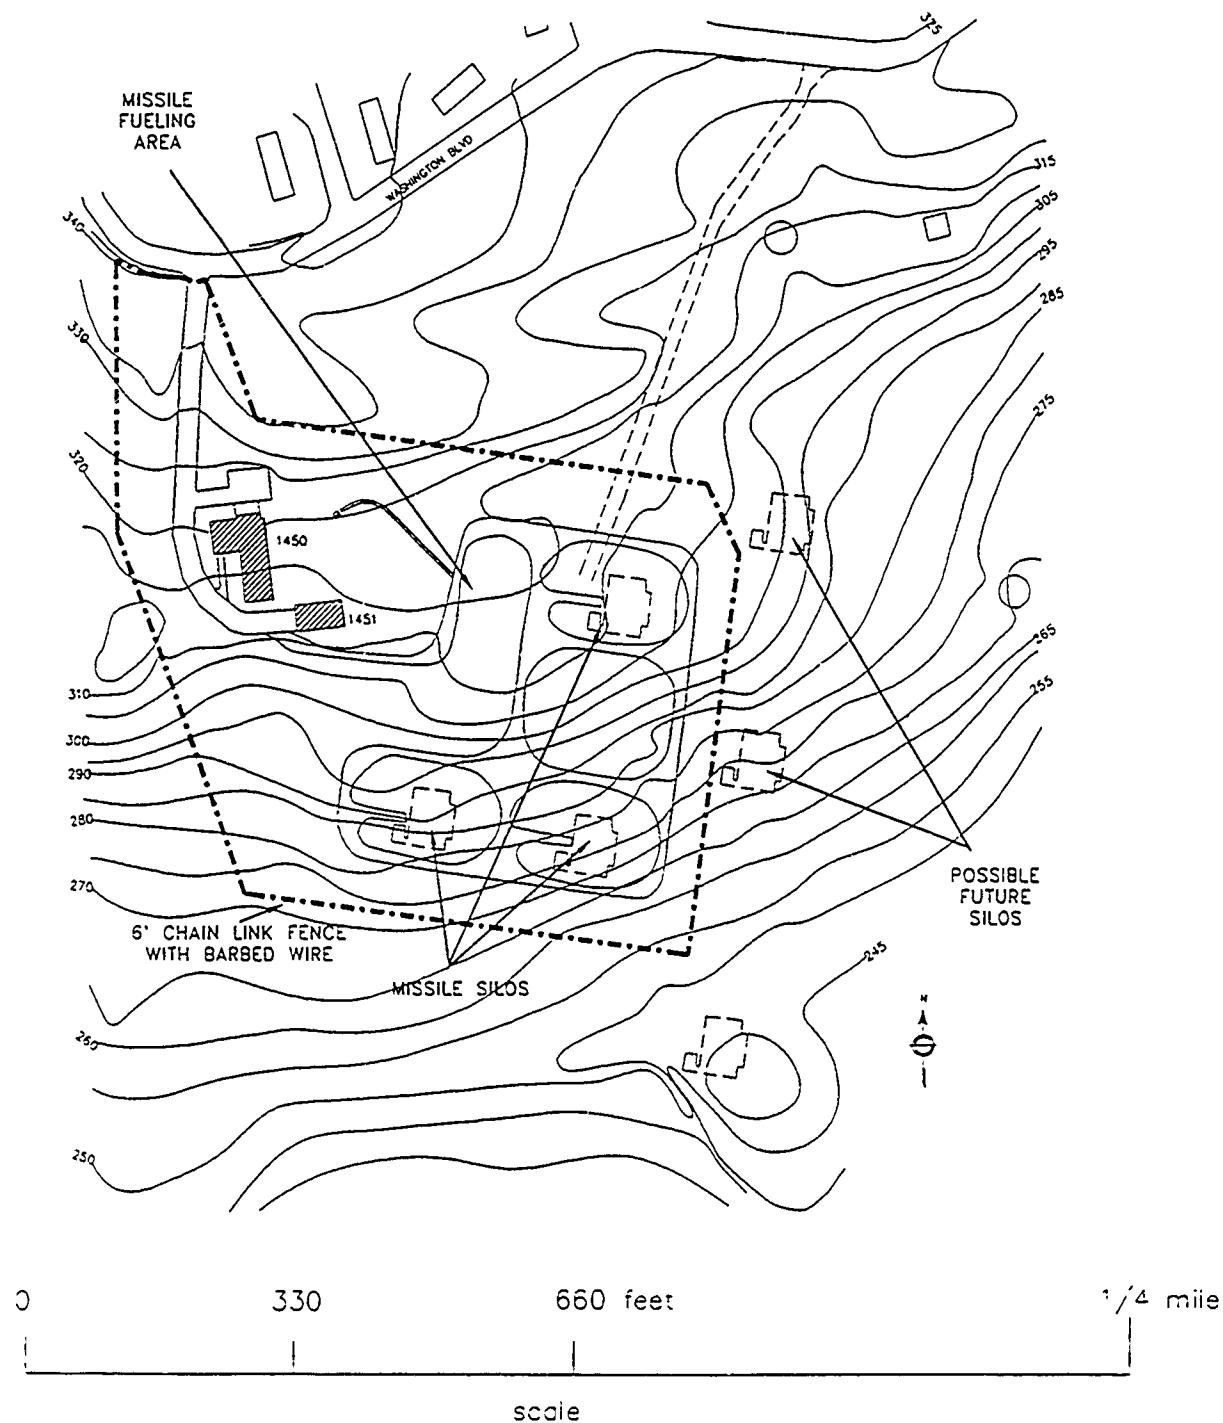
Site Plan for Former Nike Battery at PSF
